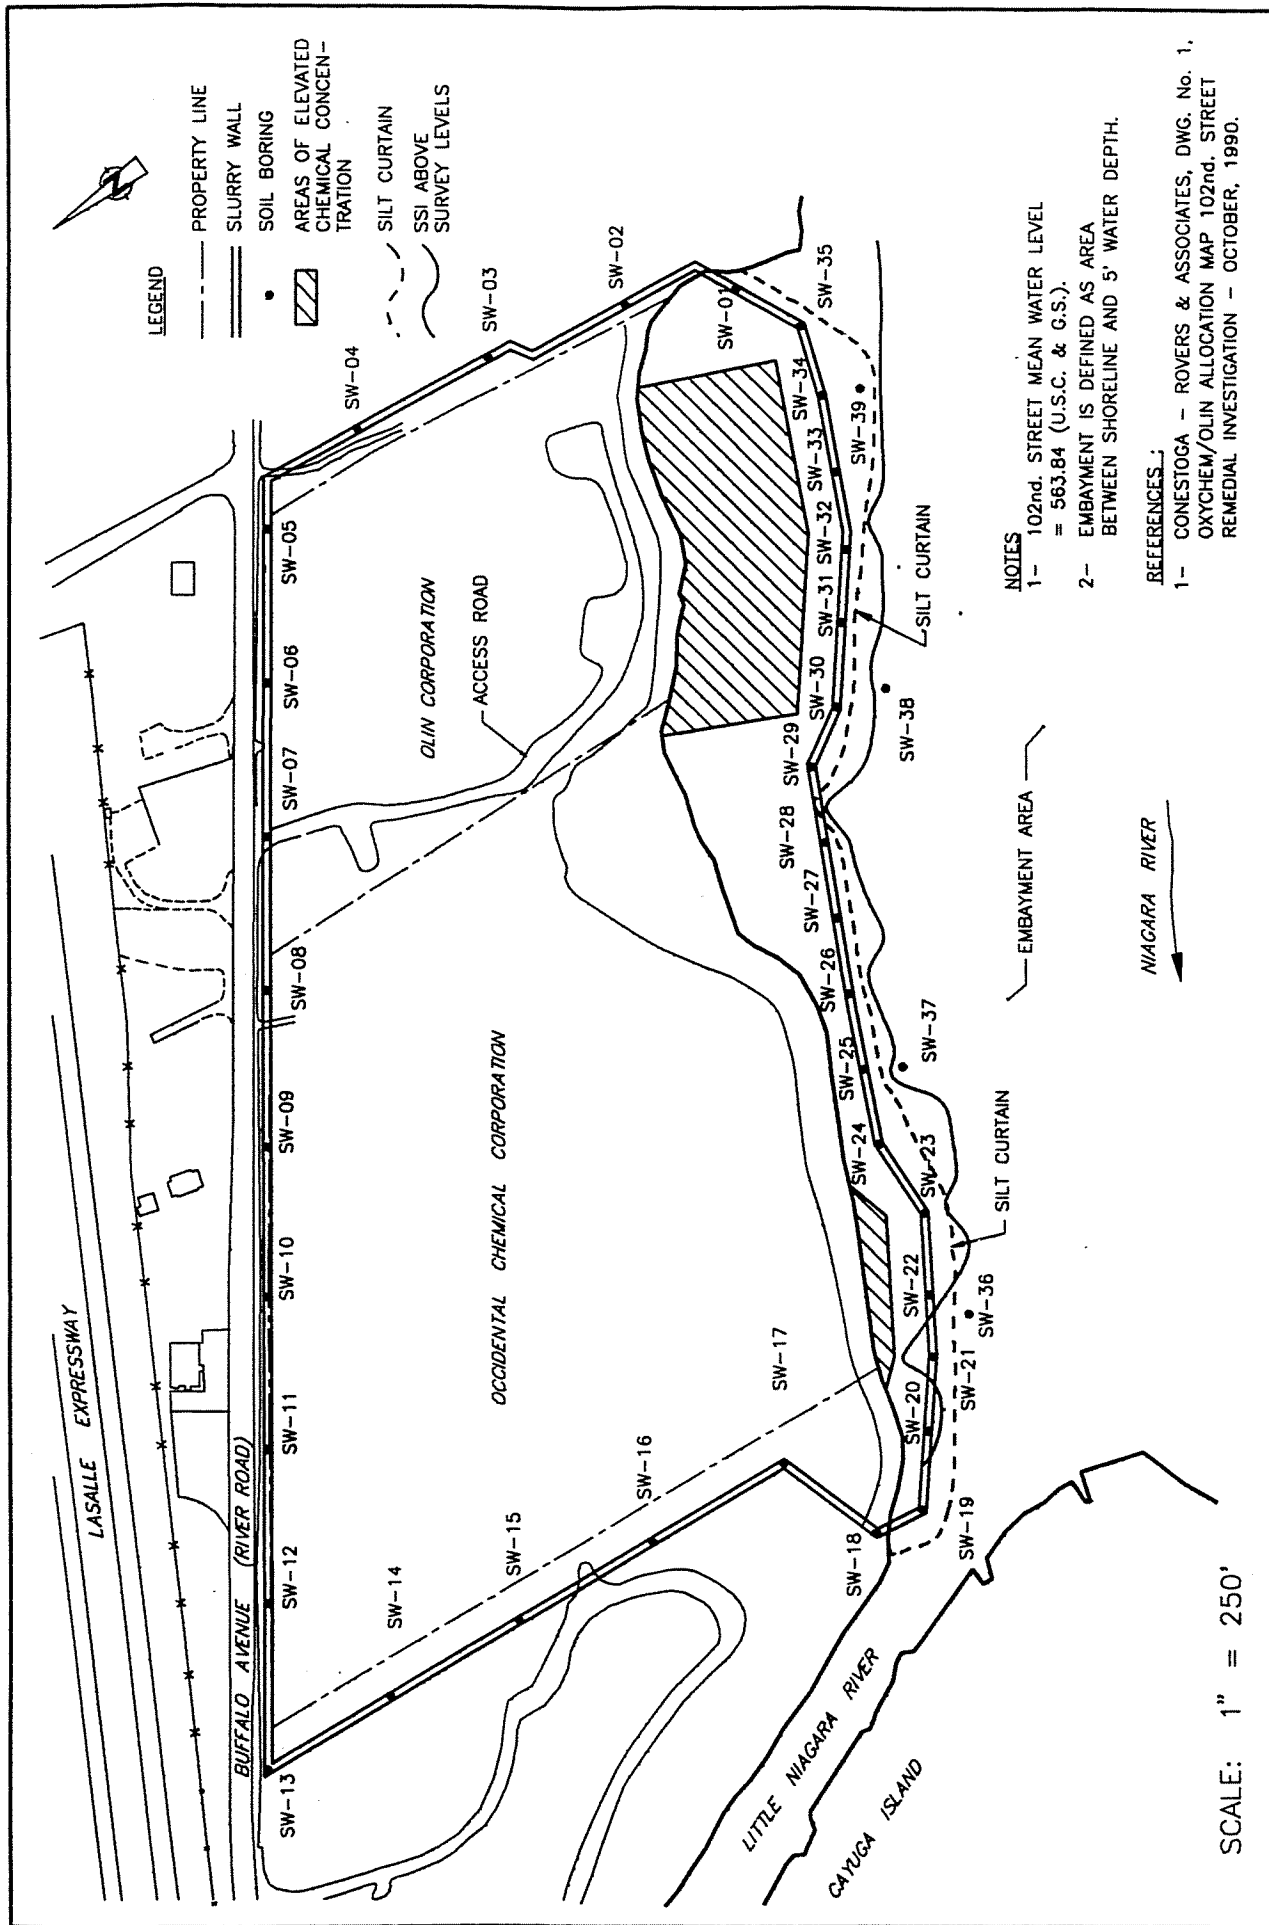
BORING LOCATION PLAN REMEDIAL DESIGN		OXYCHEM/OLIN 102nd Street Landfill Site FLUOR DANIEL
